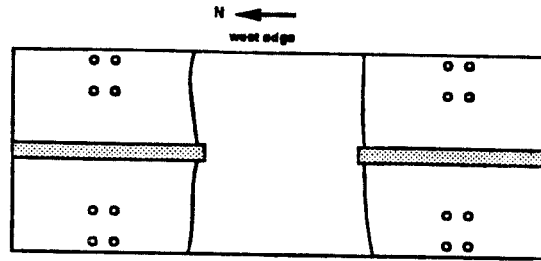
Sp. 2a: Progression of Cracking of Bottom Face of Second Floor Slab at Load Point 135
